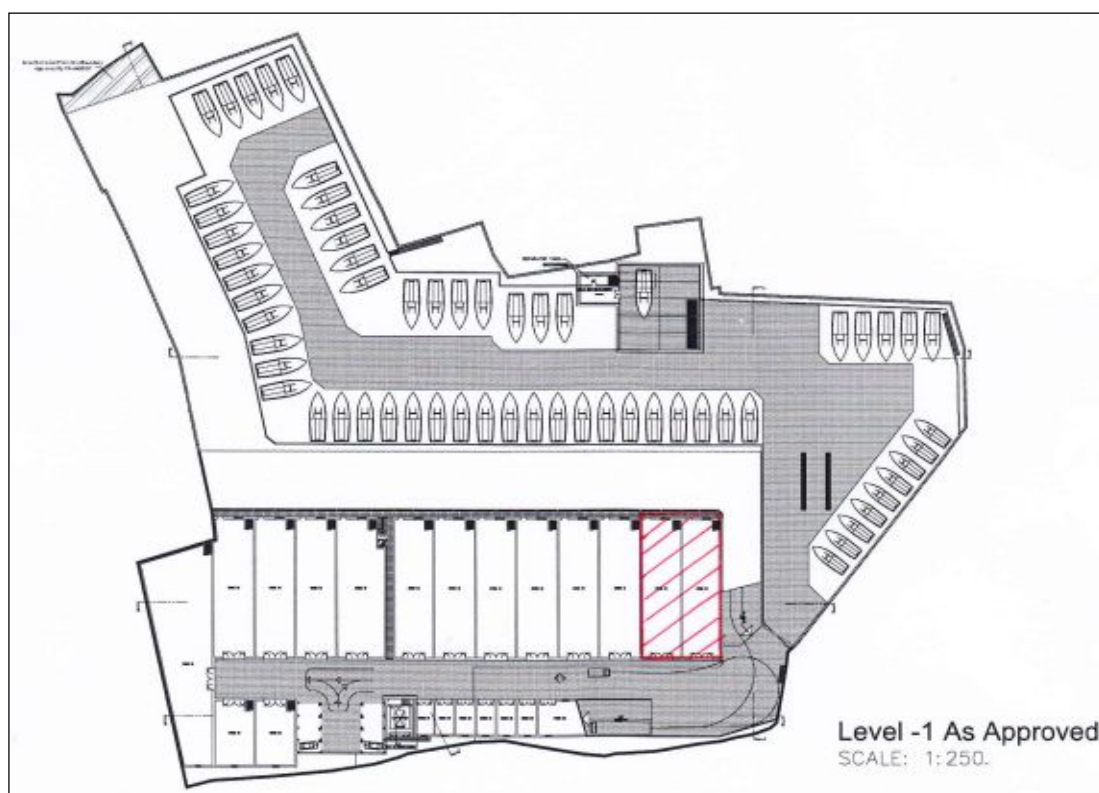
Site plan of permitted installation, showing extent of area permitted under this permit delineated in red
